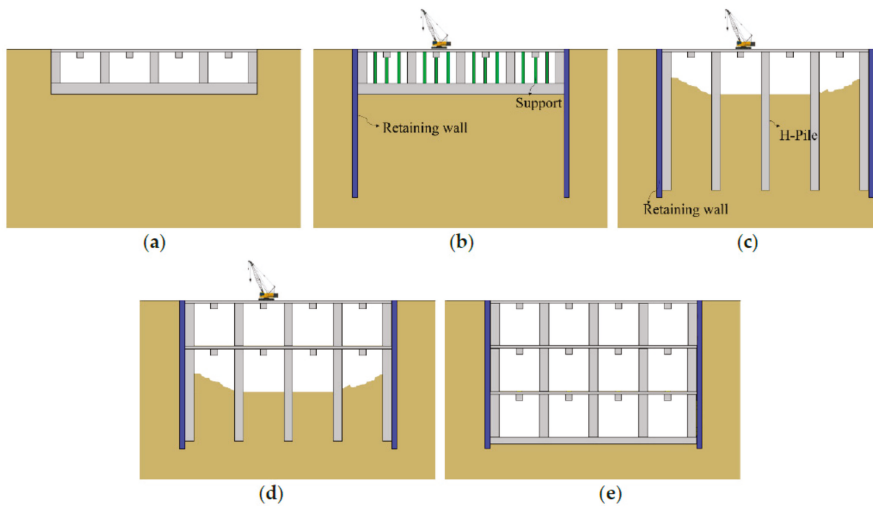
Vertical extension process for existing underground spaces using the normal top-down method (from a building with one basement floor to three basement floors). The process is listed as: (a) Existing underground spaces before works; (b) Installing of earth retaining walls after reinforcing existing structure; (c) Demolition of basement Level 1 and structural frame construction (columns) after installing earth retaining walls; (d) Excavation and construction of structural frame (slabs and beams) (from B2 to B3); and (e) Completion.
